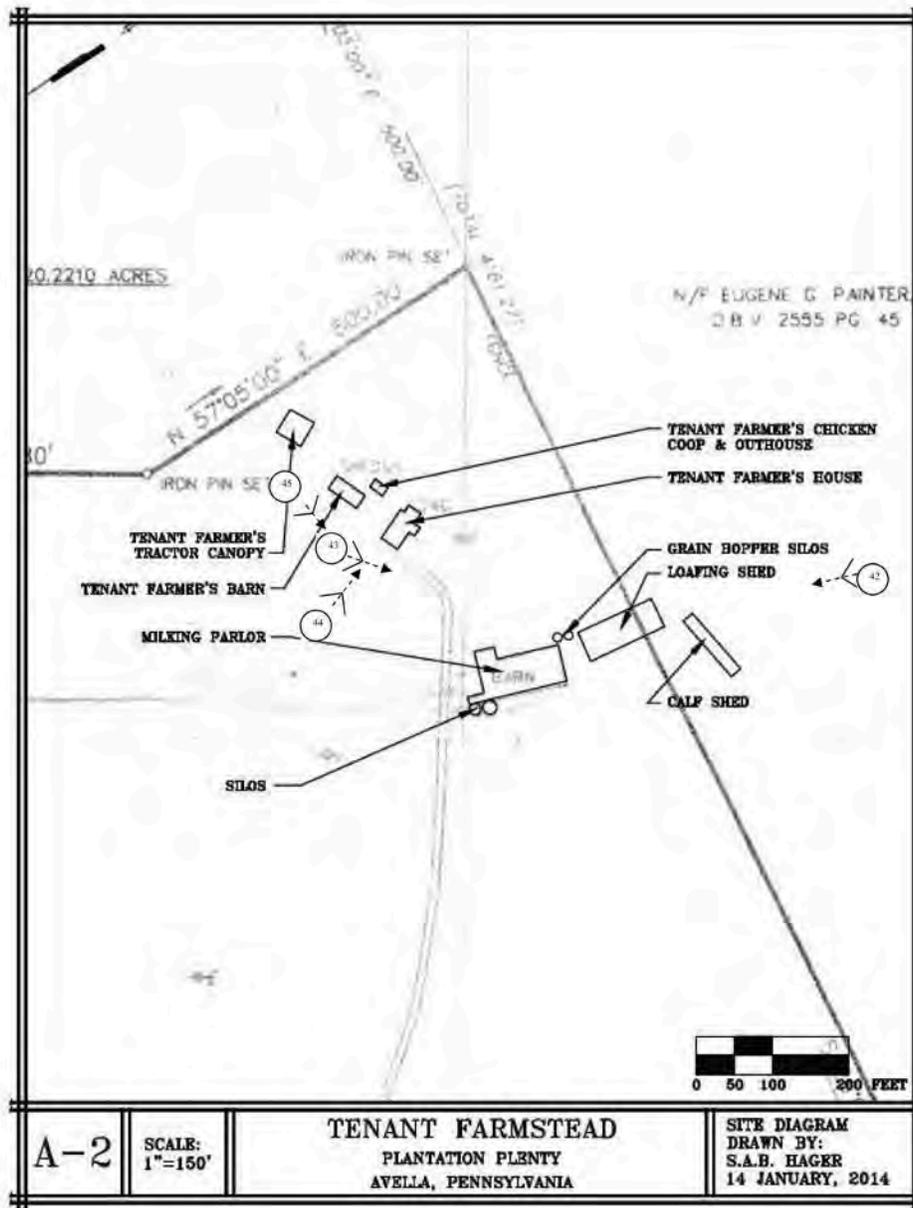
Plantation Plenty Tenant Farmstead Photo Key Plan
